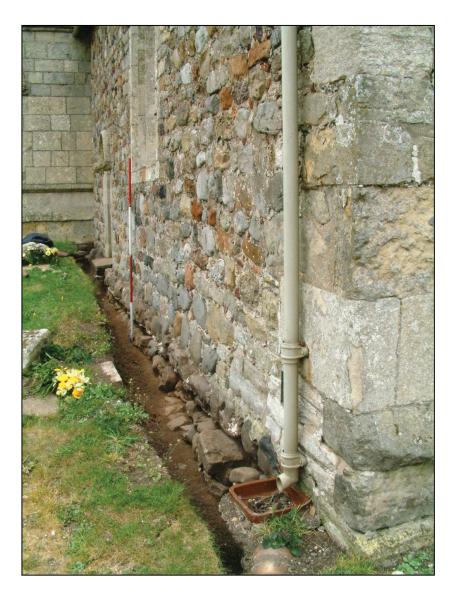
Exposed foundations (021) of south chancel wall, looking W.
